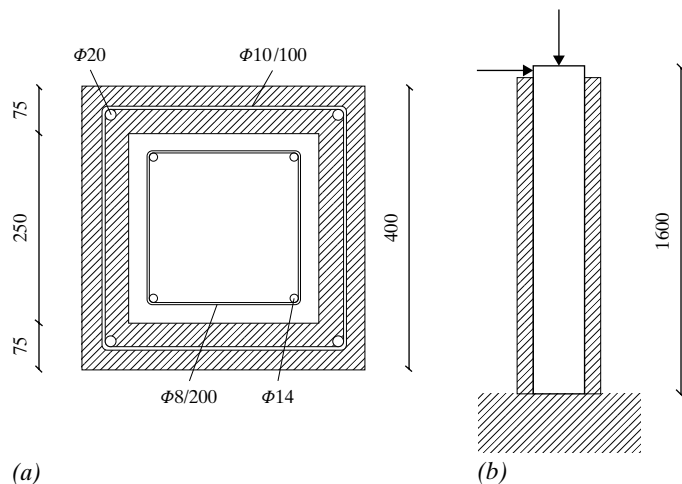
(a) Cross section and (b) vertical section of the strengthened column (Units: mm)
